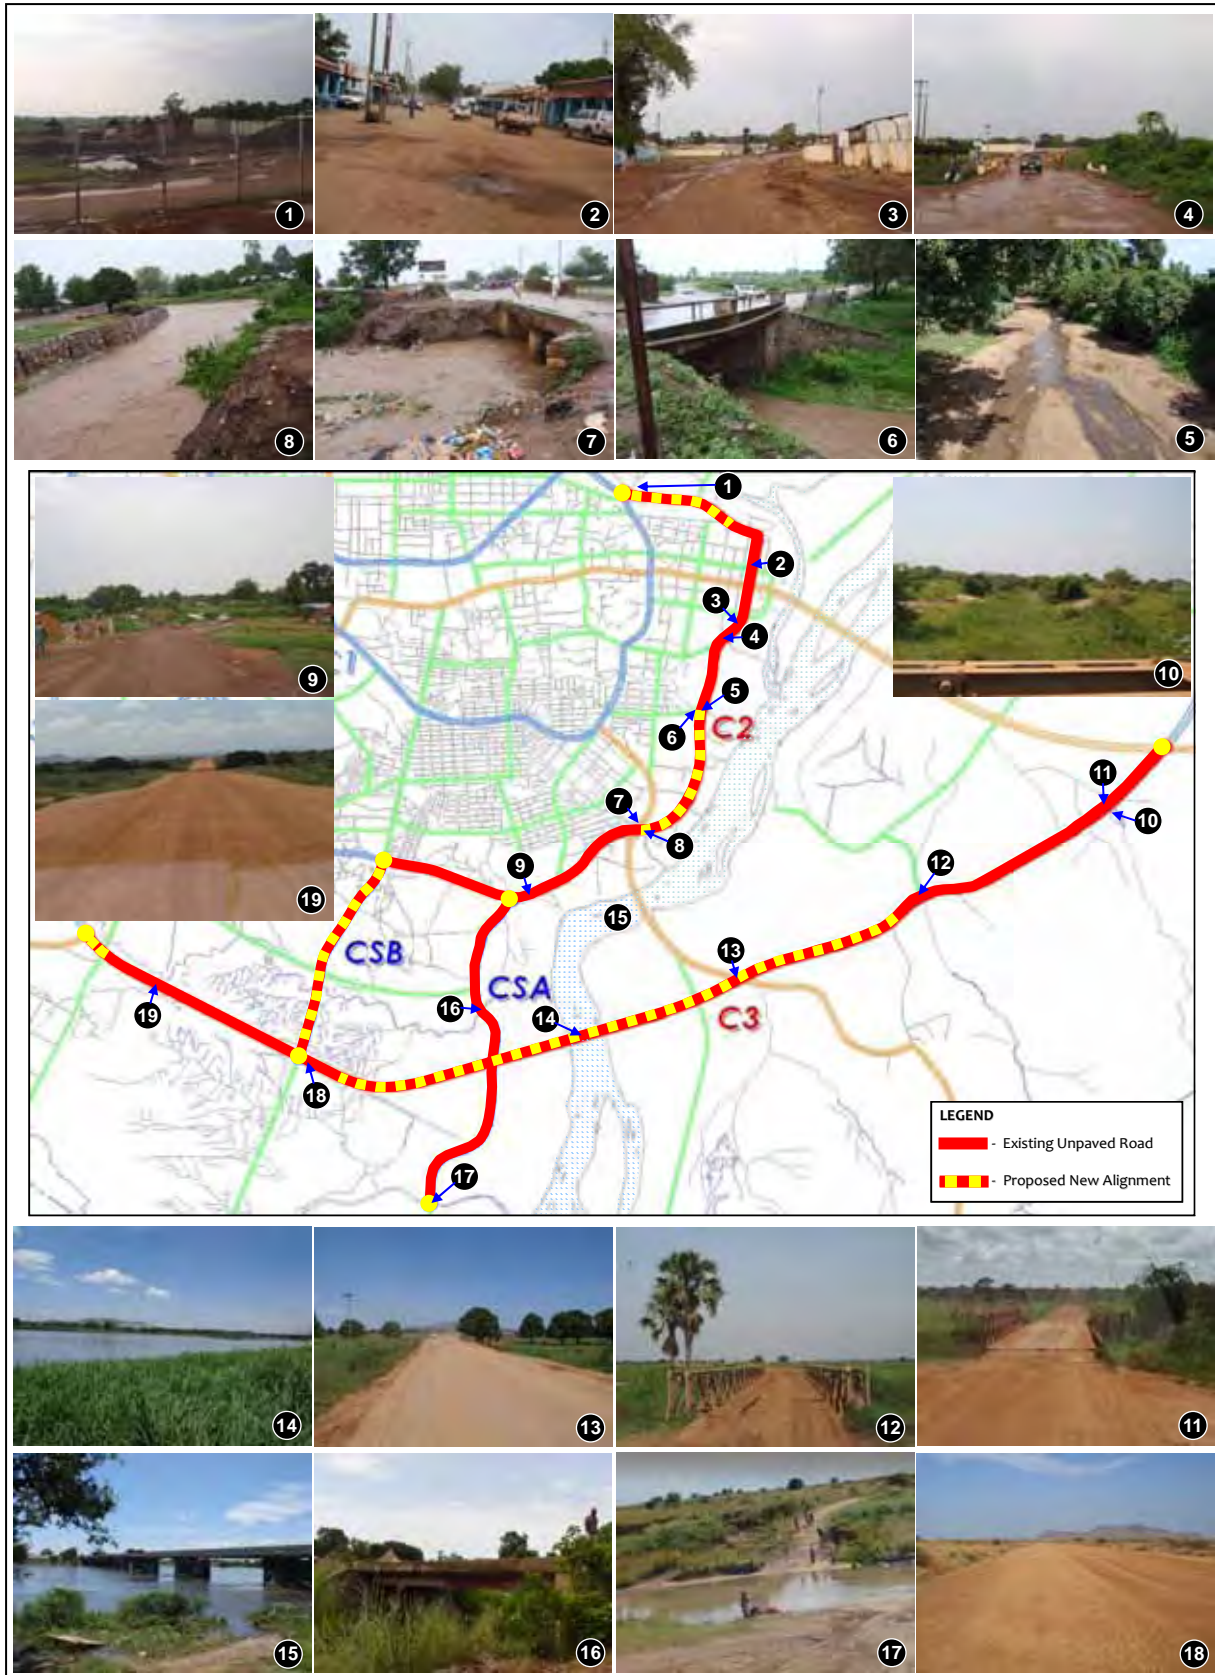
Existing Conditions of Study Roads at Bridge/Culvert Sites
